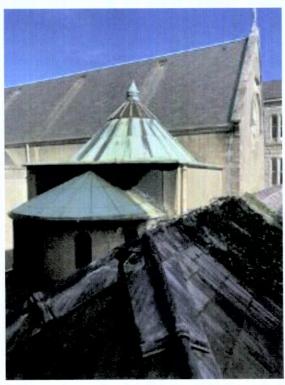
Copper Roof of sacristy, building D2, with slate roof of link building in foreground.
